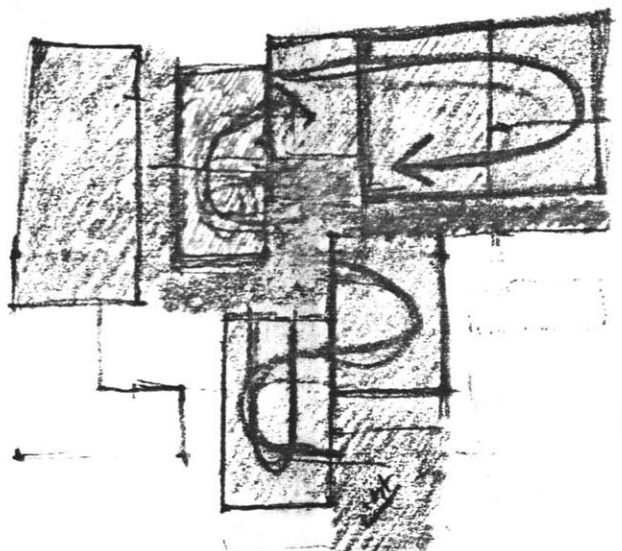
'1'. Site plan. Access Study. Circulation 'loops'.
